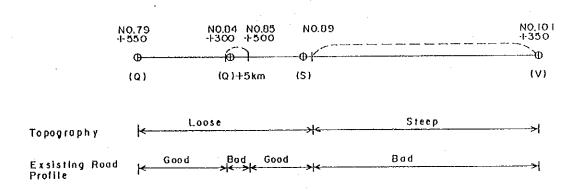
Topography and Profile Condition of Existing Road
